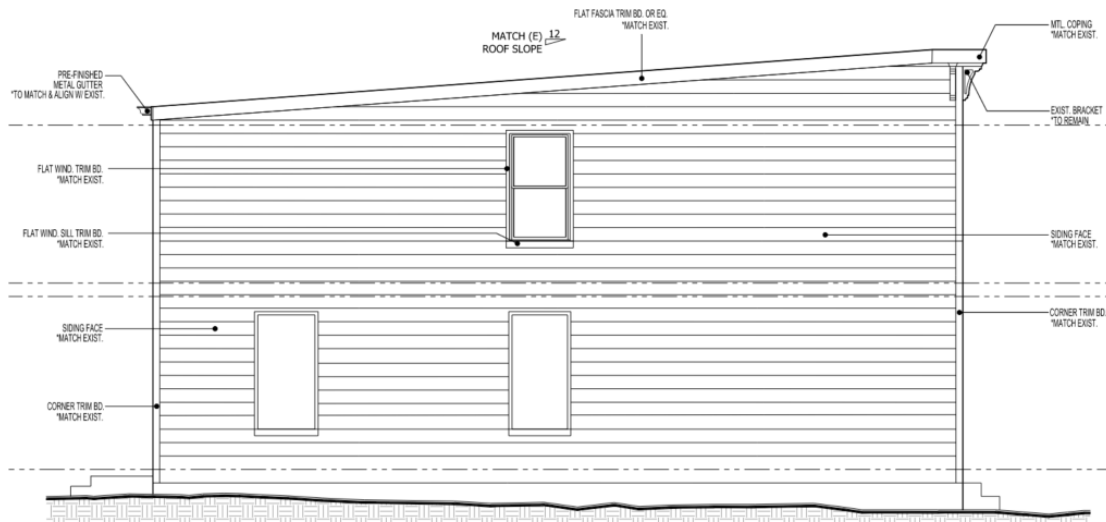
Proposed east elevation with addition on right (Note that addition is recessed)
